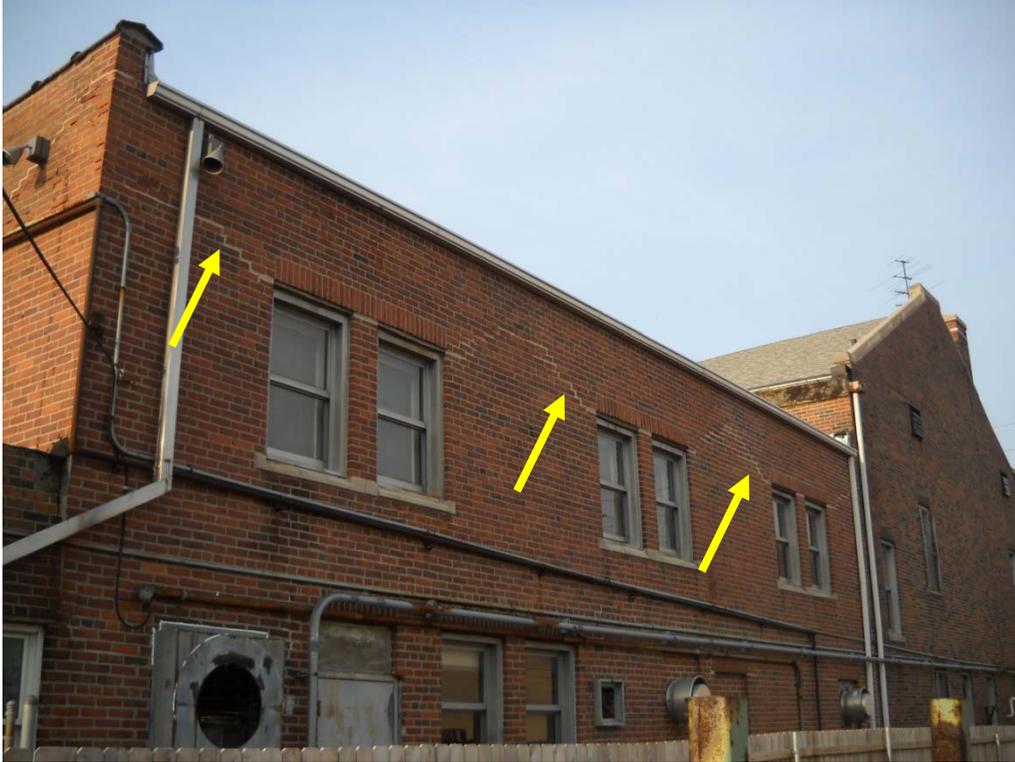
Previously repaired cracks in brick masonry on the north elevation
